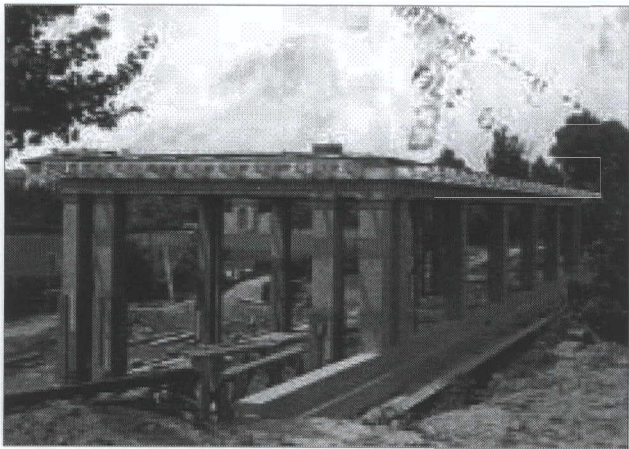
The lodge under construction circa July, looking northwest with the back retaining wall in the foreground. 1923 (RCP-CRF).
